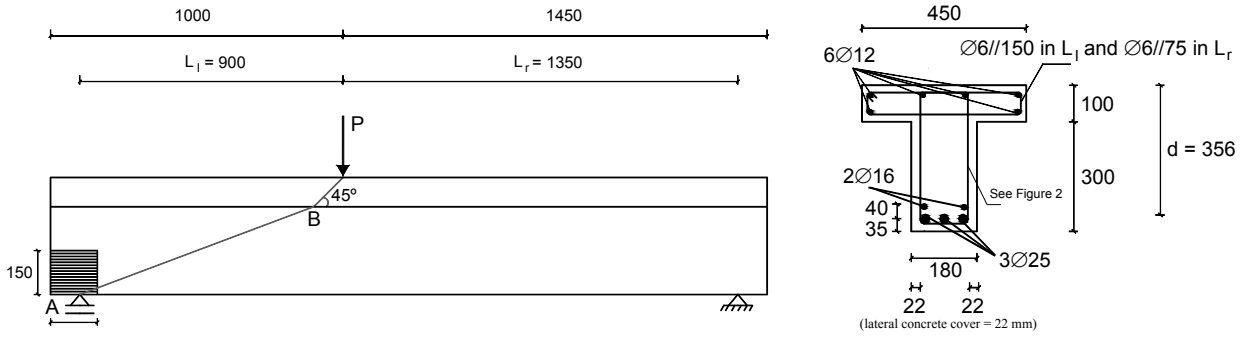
Tested beams: geometry, steel reinforcements applied in all beams and CFRP-based strengthening configuration of the most loaded beam support (dimensions in mm).
